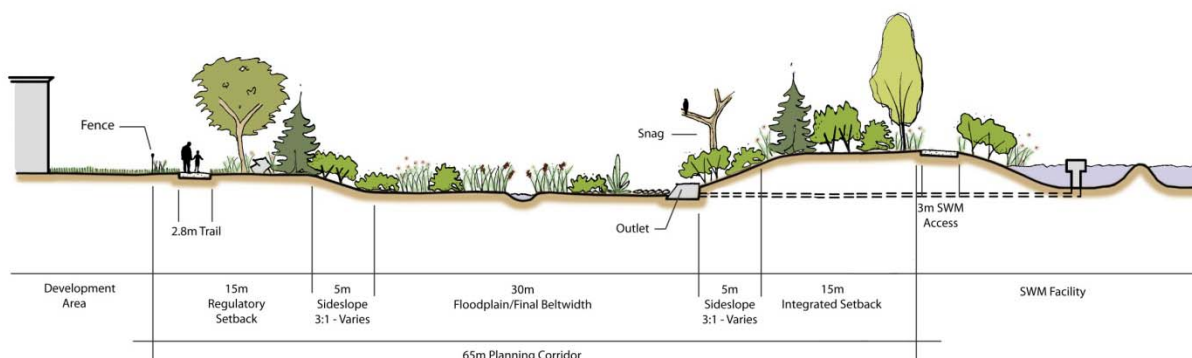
Cross-Section of Watercourse Planning Corridor Adjacent to Stormwater Facility
